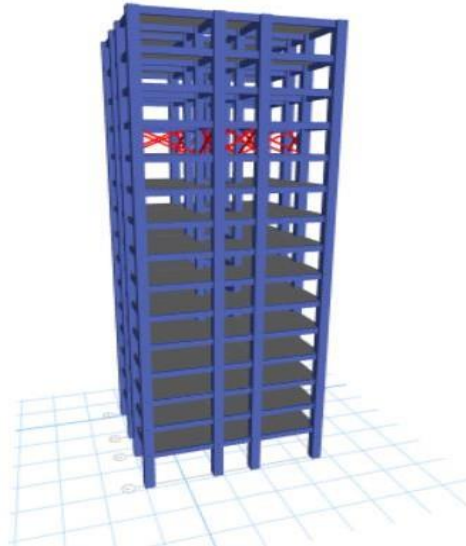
3D view of structure in ETABS mode One floor outrigger.
